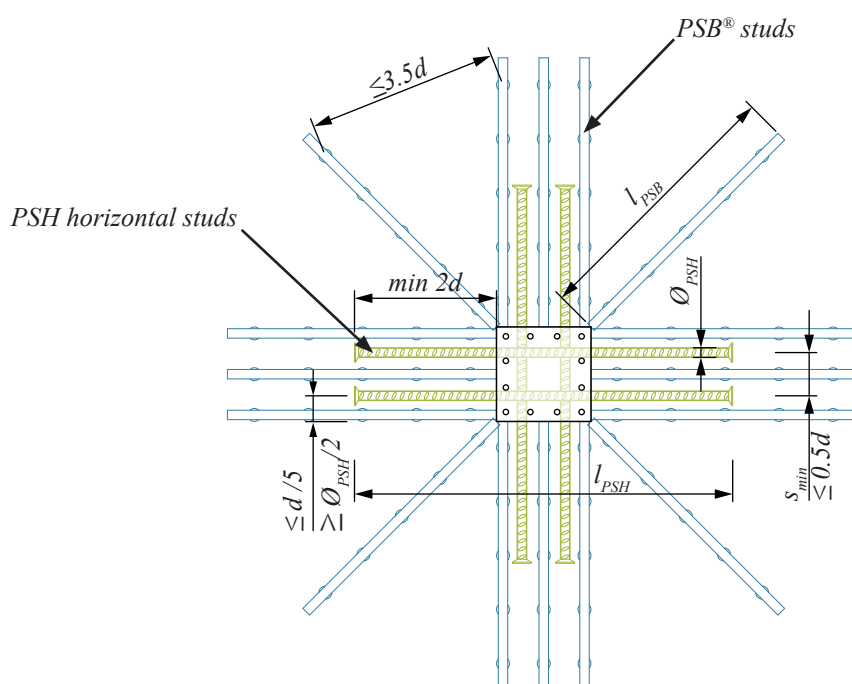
Top view of PSB PLUS® in a floor slab with small column, $n_{PSH} = 12pcs$.
